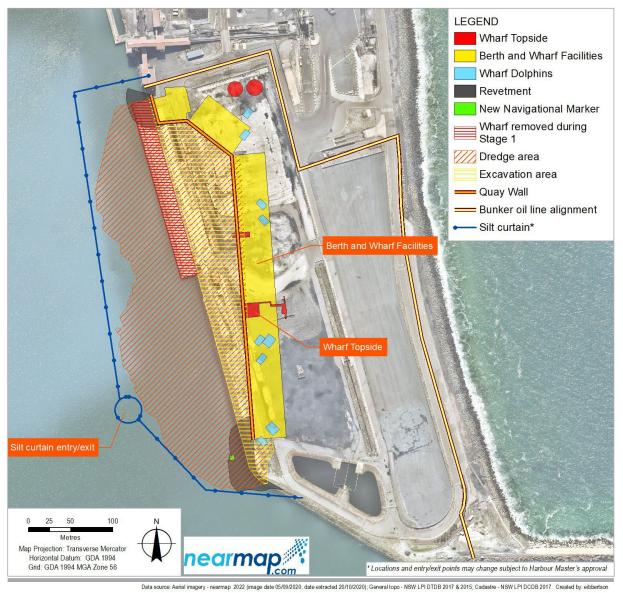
Dredging and excavation works for MBD Site Compound (Stage 2B)
